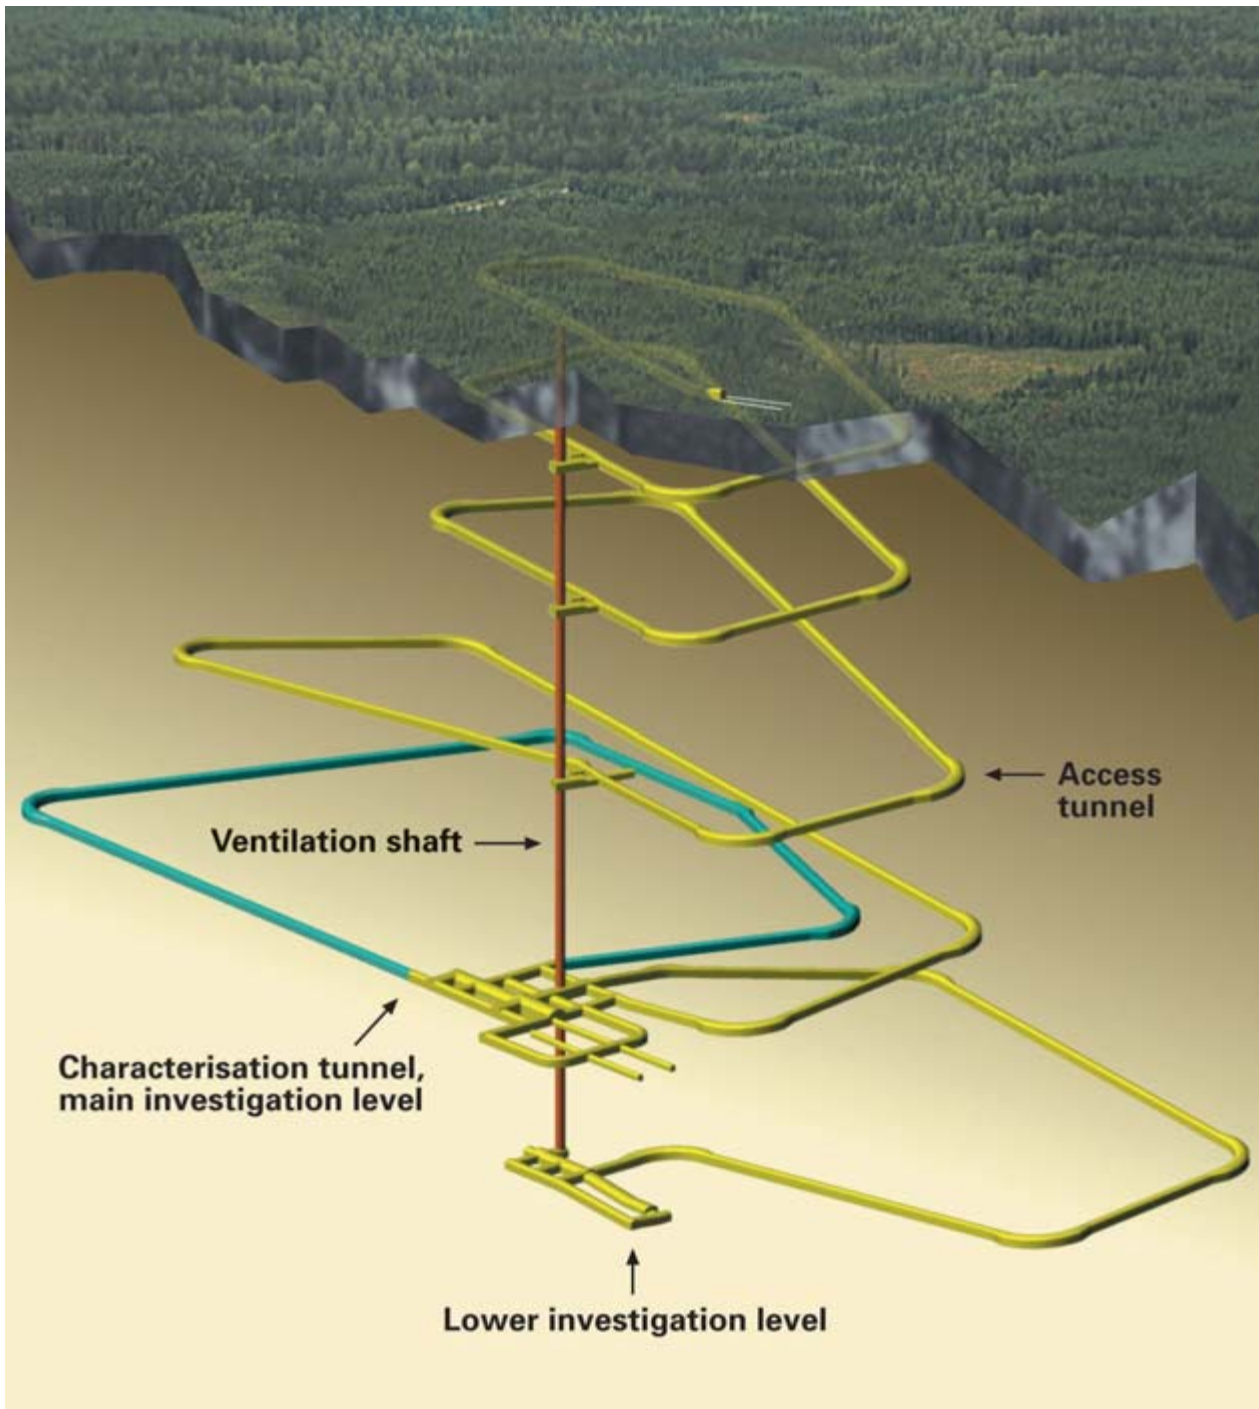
The underground rock characterization laboratory Onkalo to be excavated at Olkiluoto (Posiva Oy, 2003).
